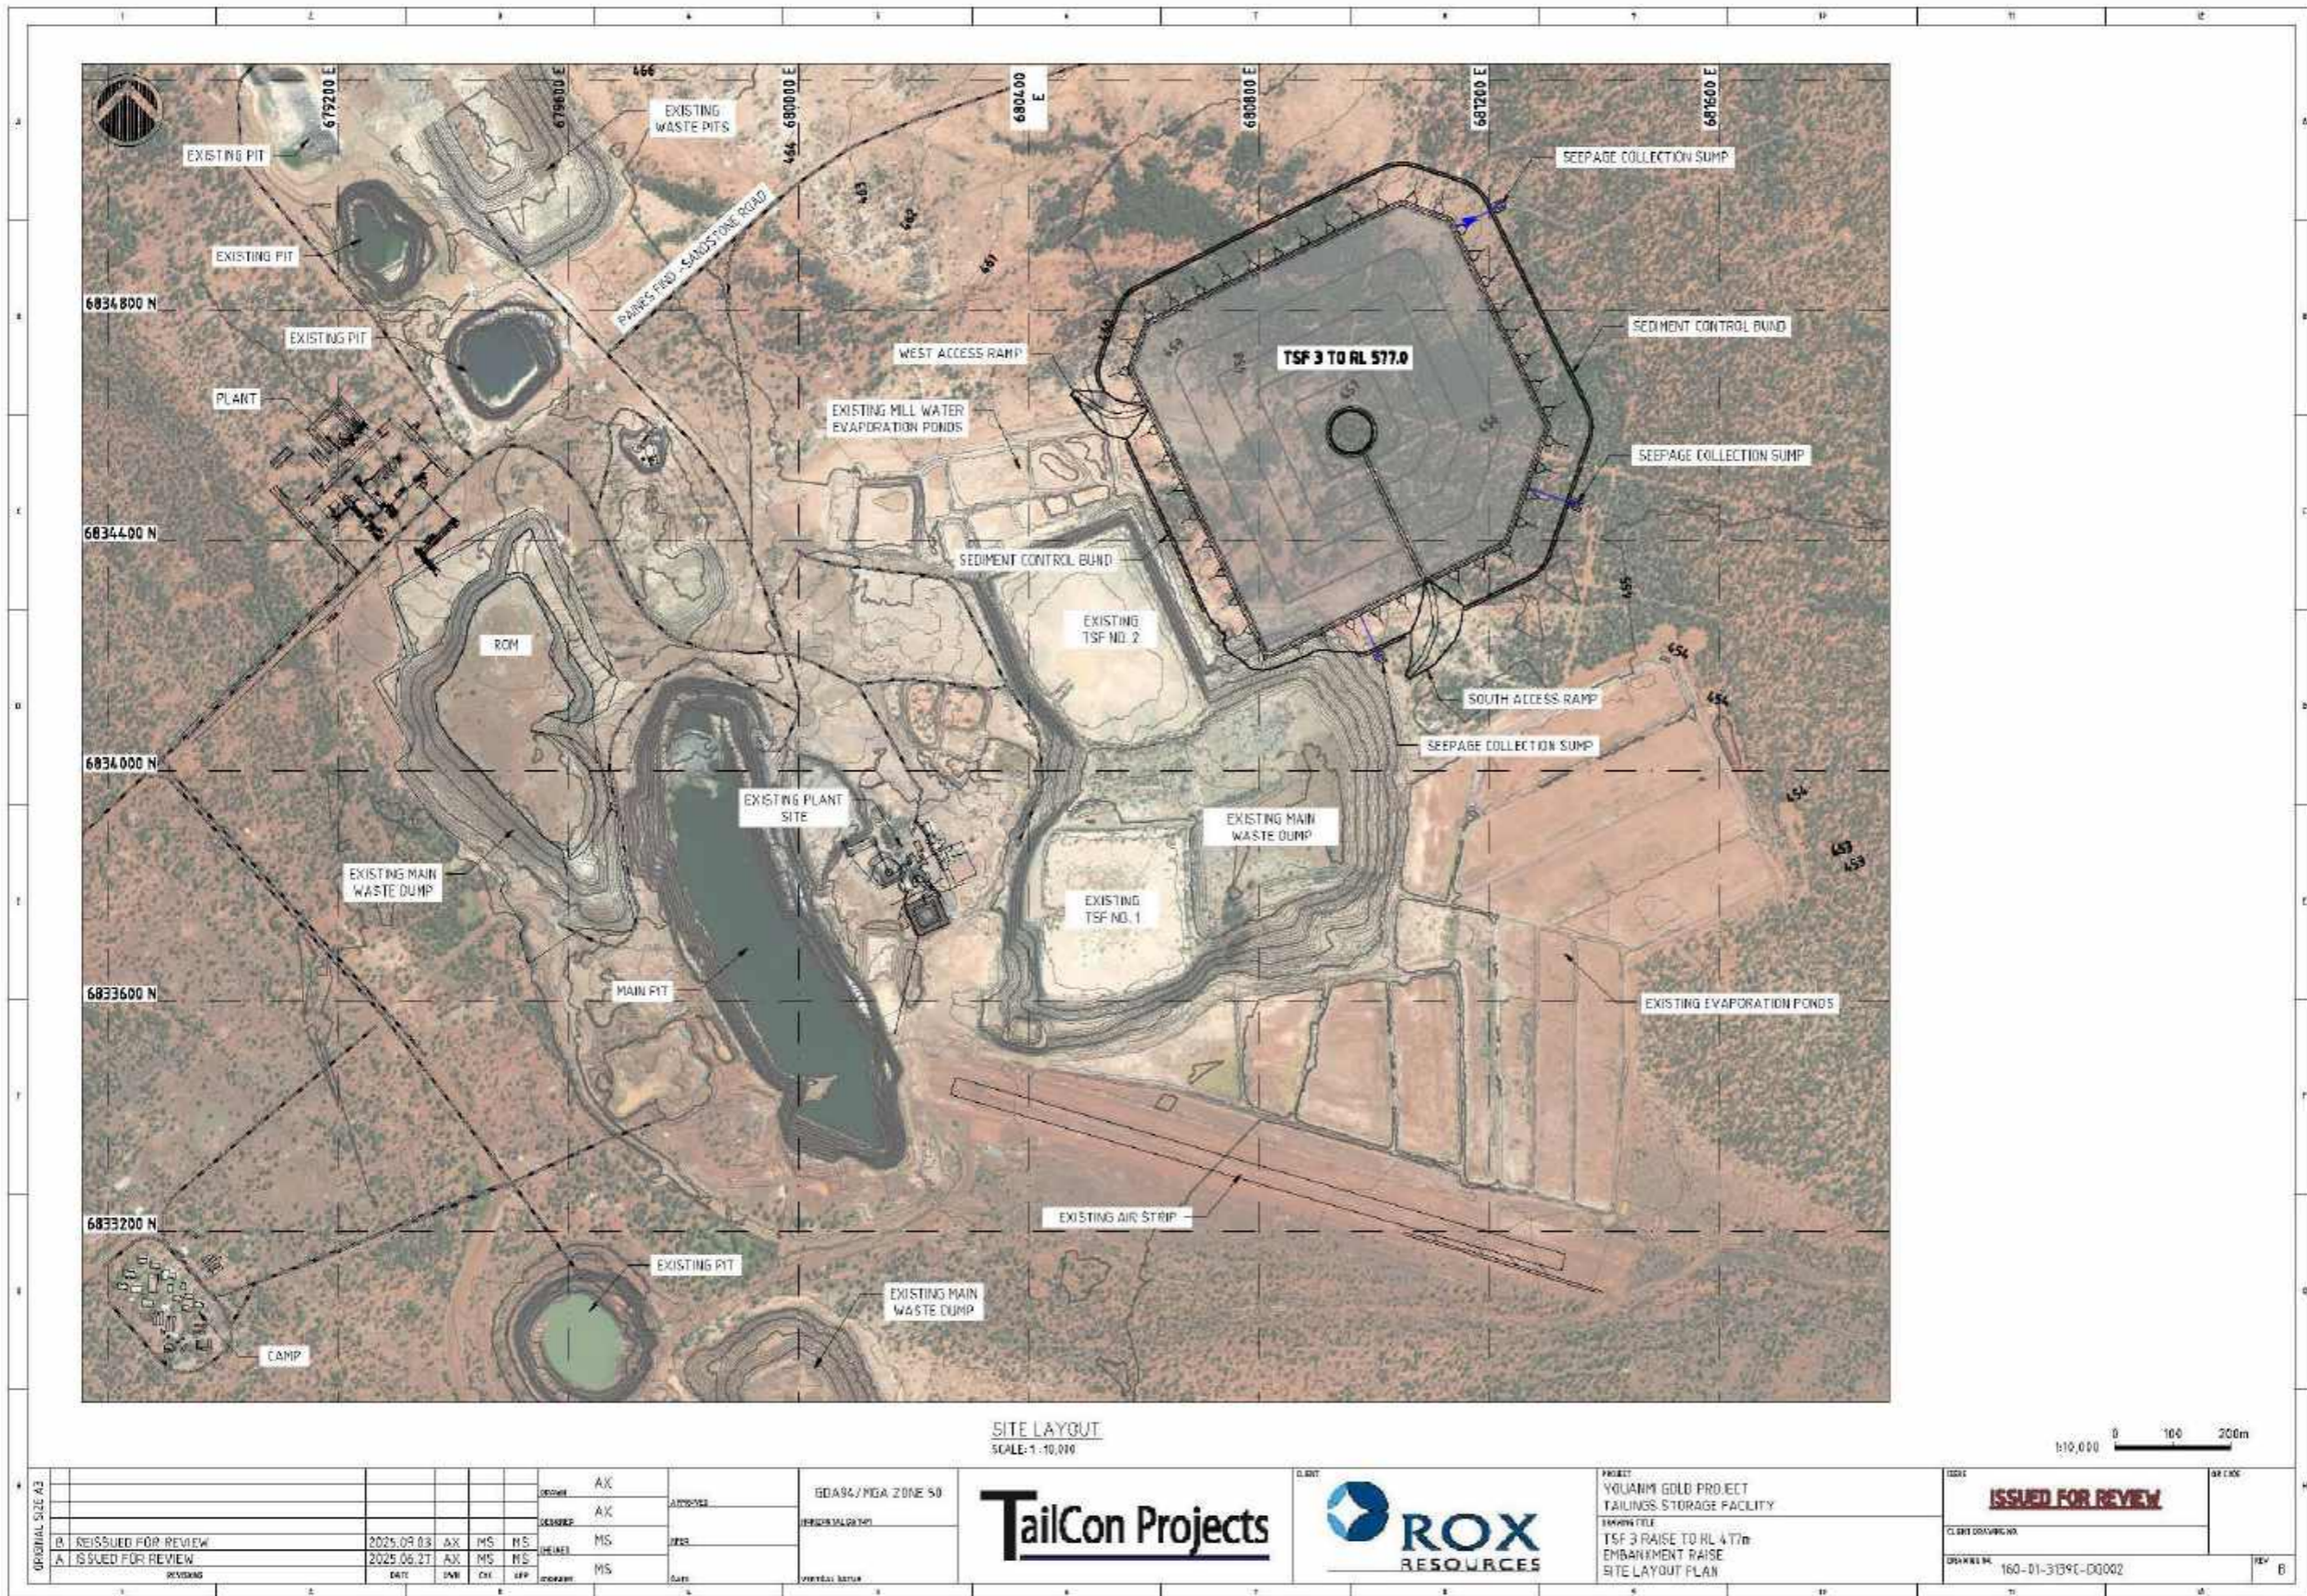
TSF3 - Site Layout Plan (TailCon 2025a)
